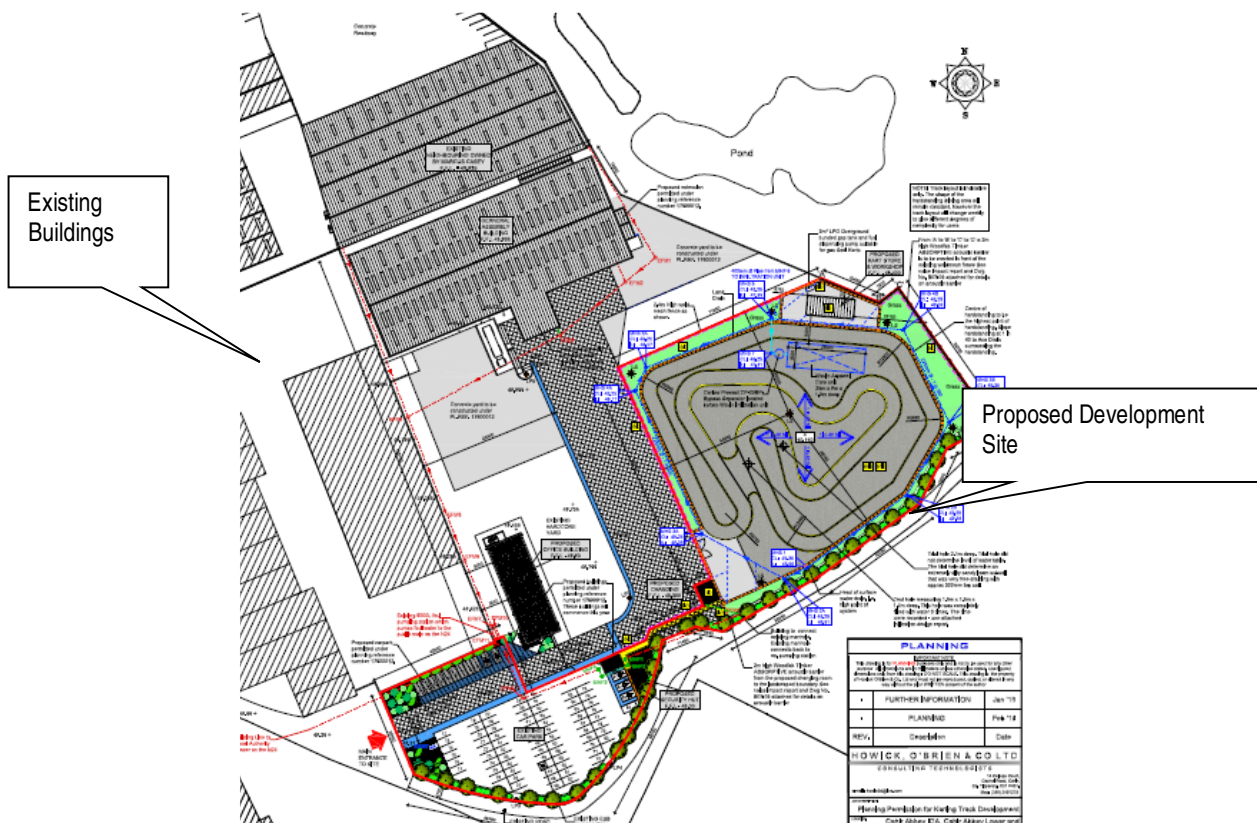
Existing buildings and access road on west and north-west side of proposed development
